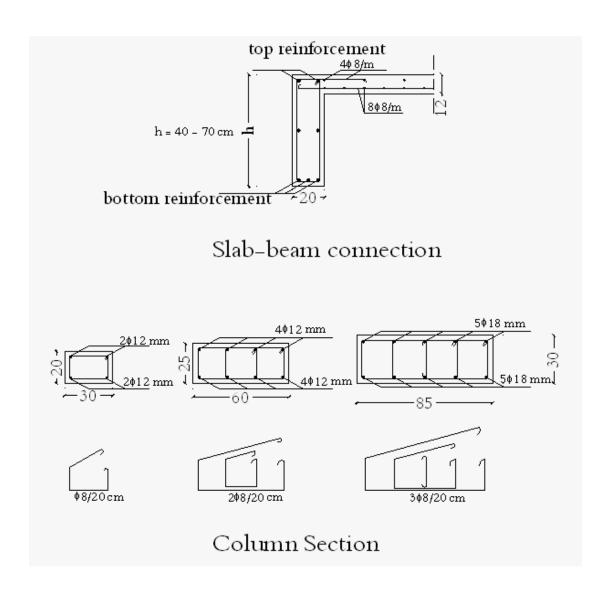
Critical Structural Details (Column Cross-Sections & Slab-Beam Connection)
